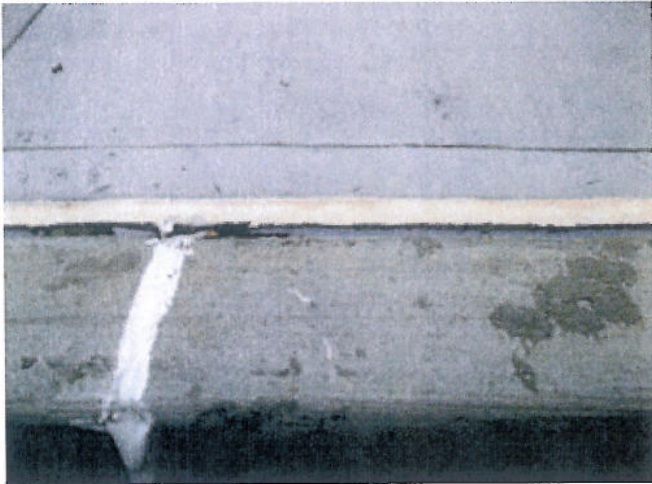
View of noticeable separation between a sidewalk and its edge by the artificial turf on North side.
